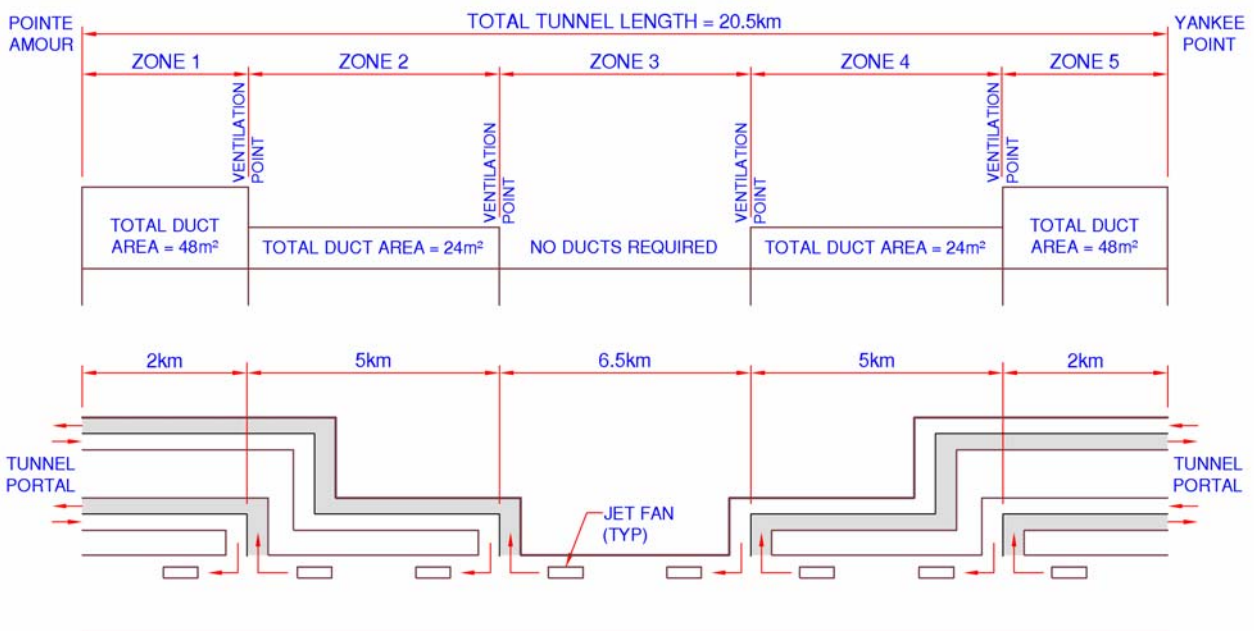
Road Tunnel Ventilation Duct Requirements
